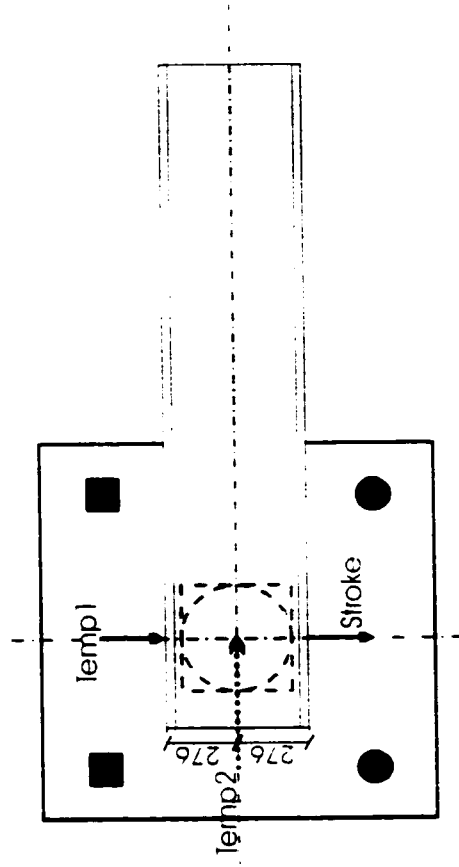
Location of the Sensors for Specimen V12168M66 (All shown dimensions are in mm units)
